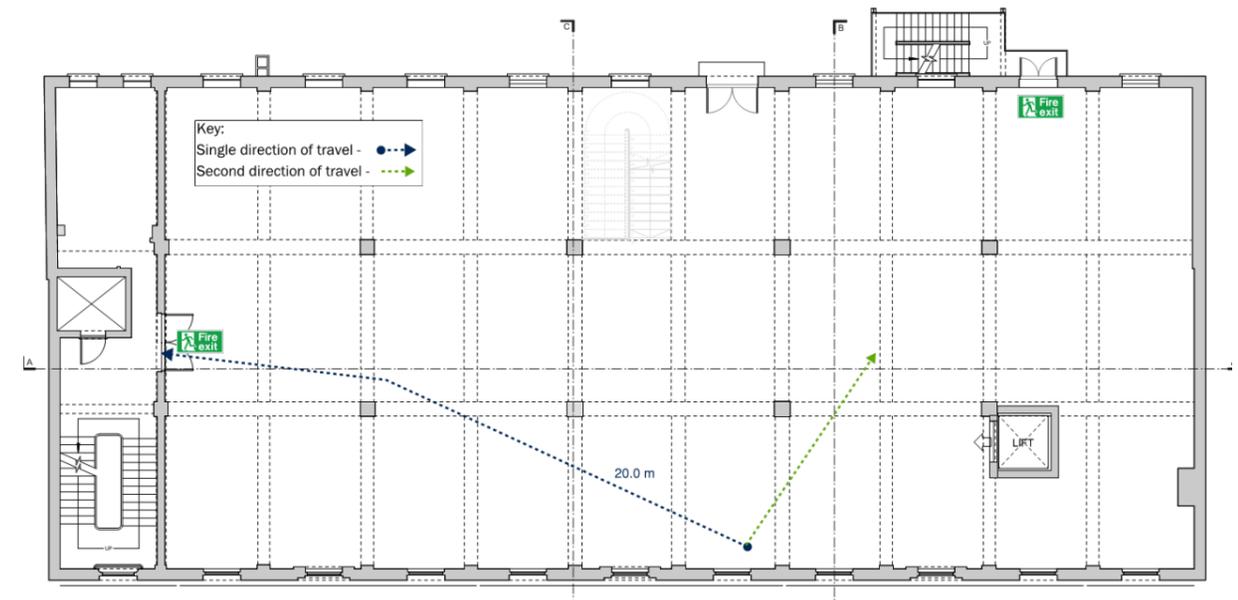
EXAMPLE OF SHORT TRAVEL DISTANCES FROM THE FLOORPLATE
